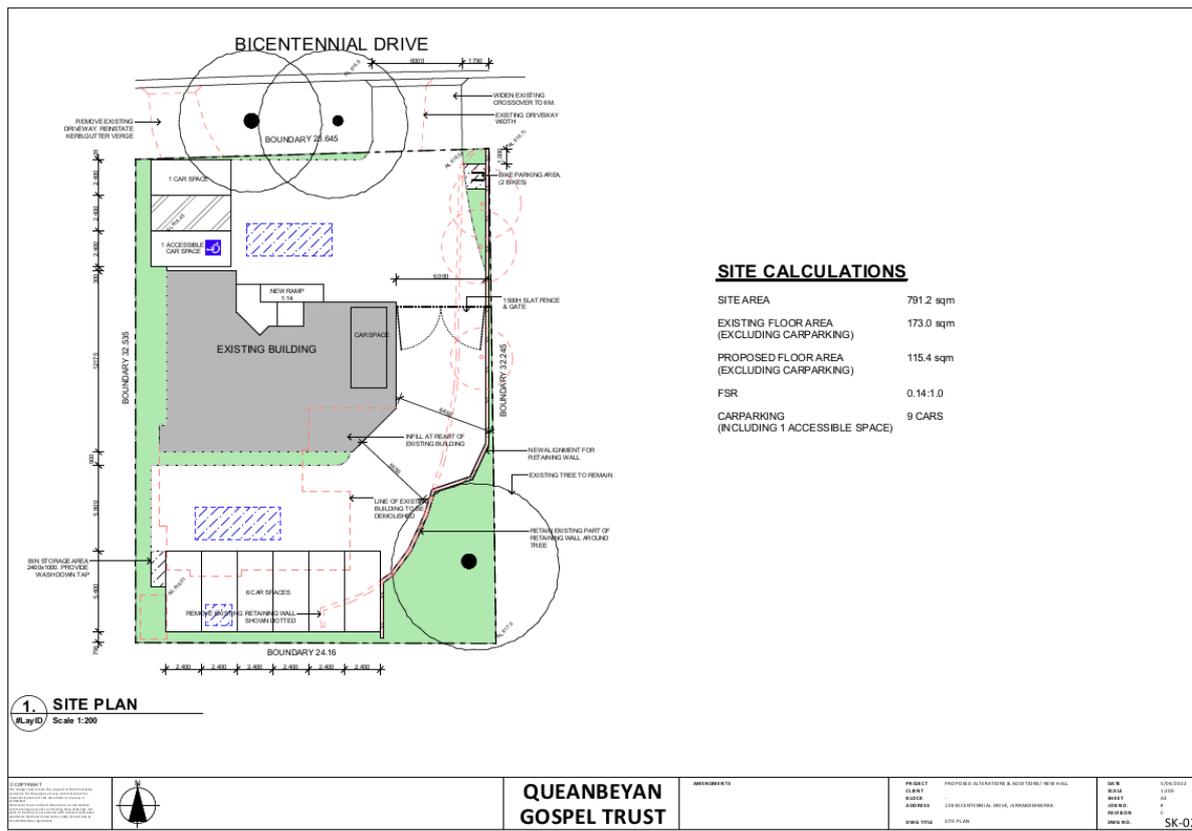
Proposed Site Plan Under Rev.2022.1002 (prepared by Spaceful)
